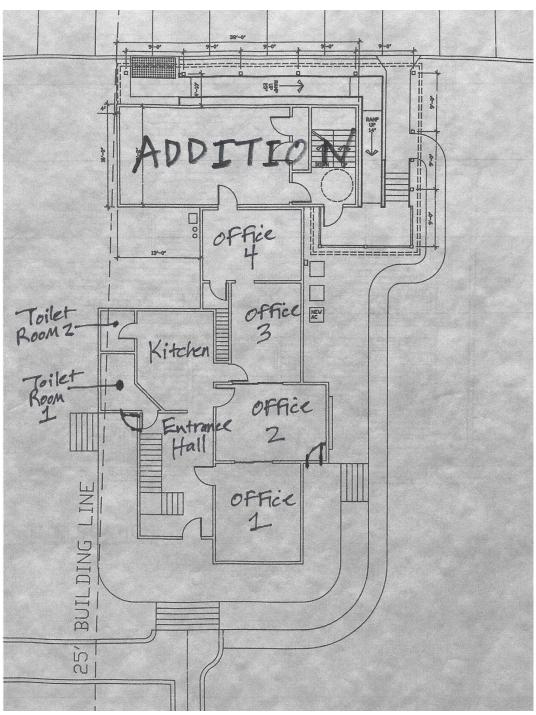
Current (2023) First Floor Plan of the Franzen House.
